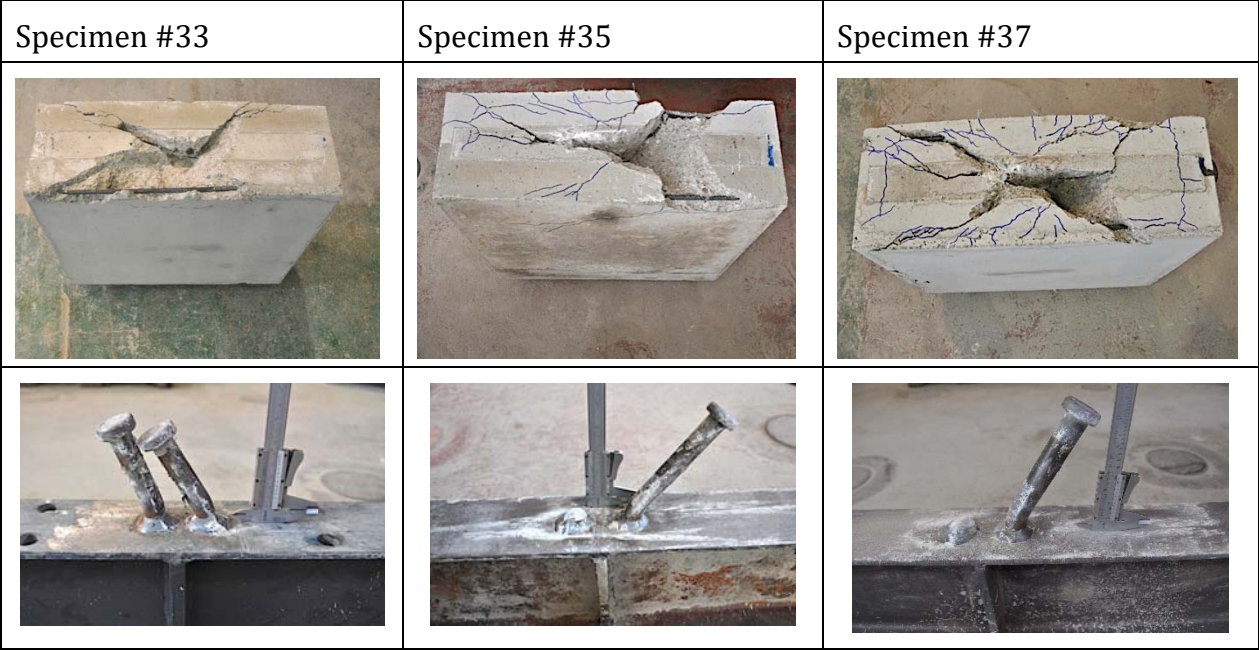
Concrete and mixed concrete and steel failure in SRS-GE configuration.
